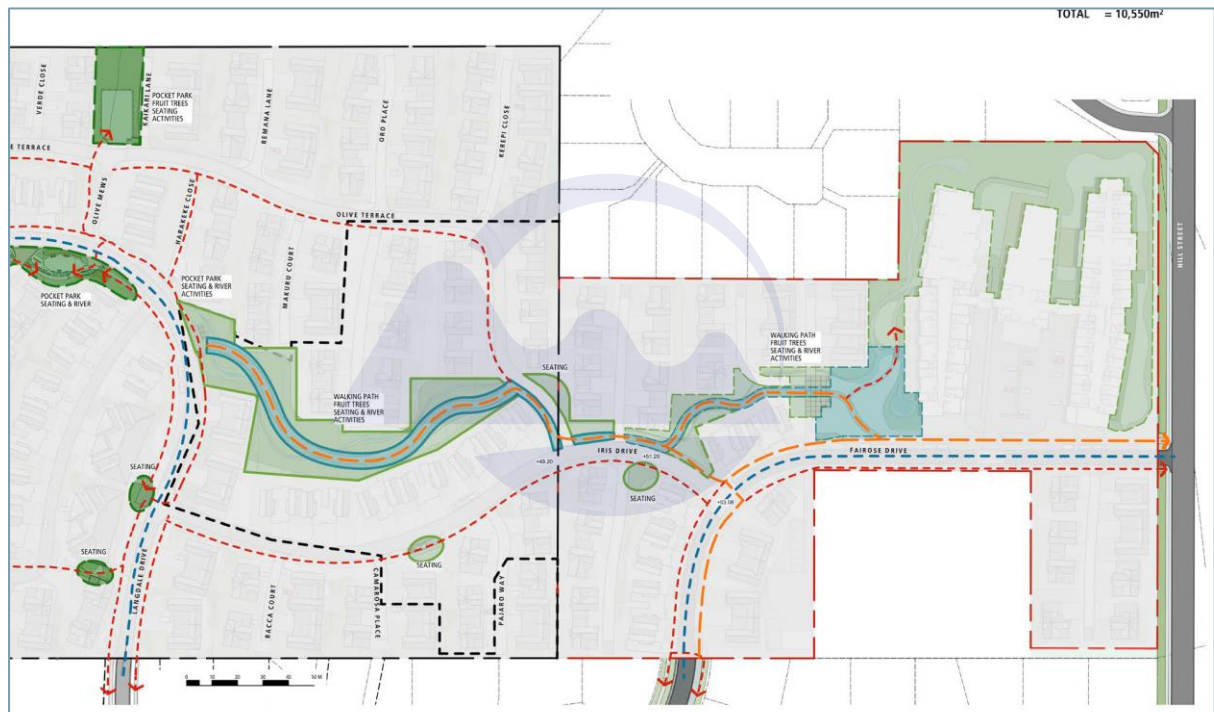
Excerpt from Masterplan Sheet 3.11 showing proposed public open space areas
